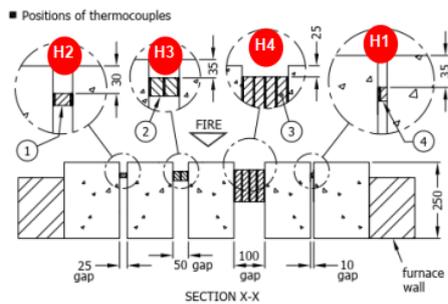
Cross-section of wall linear gap systems H1-H4 – assessment 2 (as shown in WF 157402) – dimensions in mm
